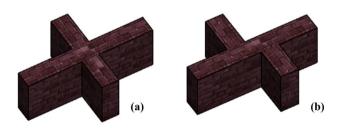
A brick wall with a cross-wall (a) and a brick wall without a cross-wall (b)
